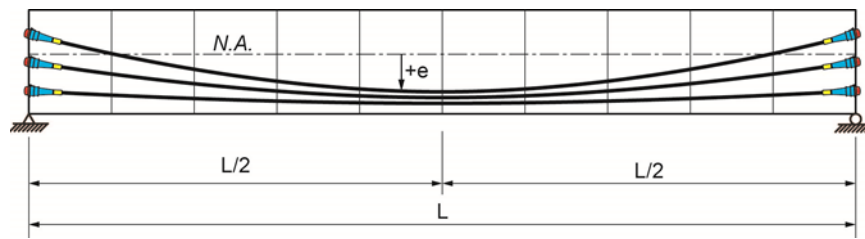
Typical Post-Tensioning Tendon Layout for Simple Spans
